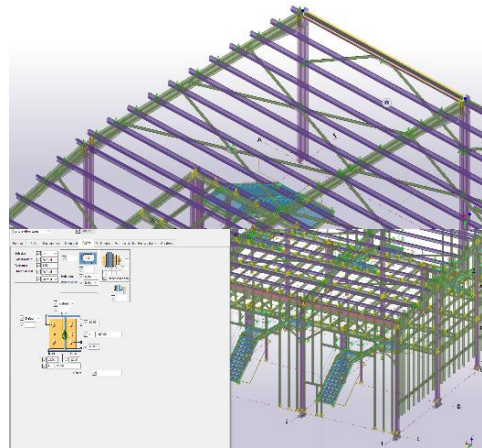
Purlin & Diagonal Structural Elements and Facade Tiling & Anchor Modeling.
